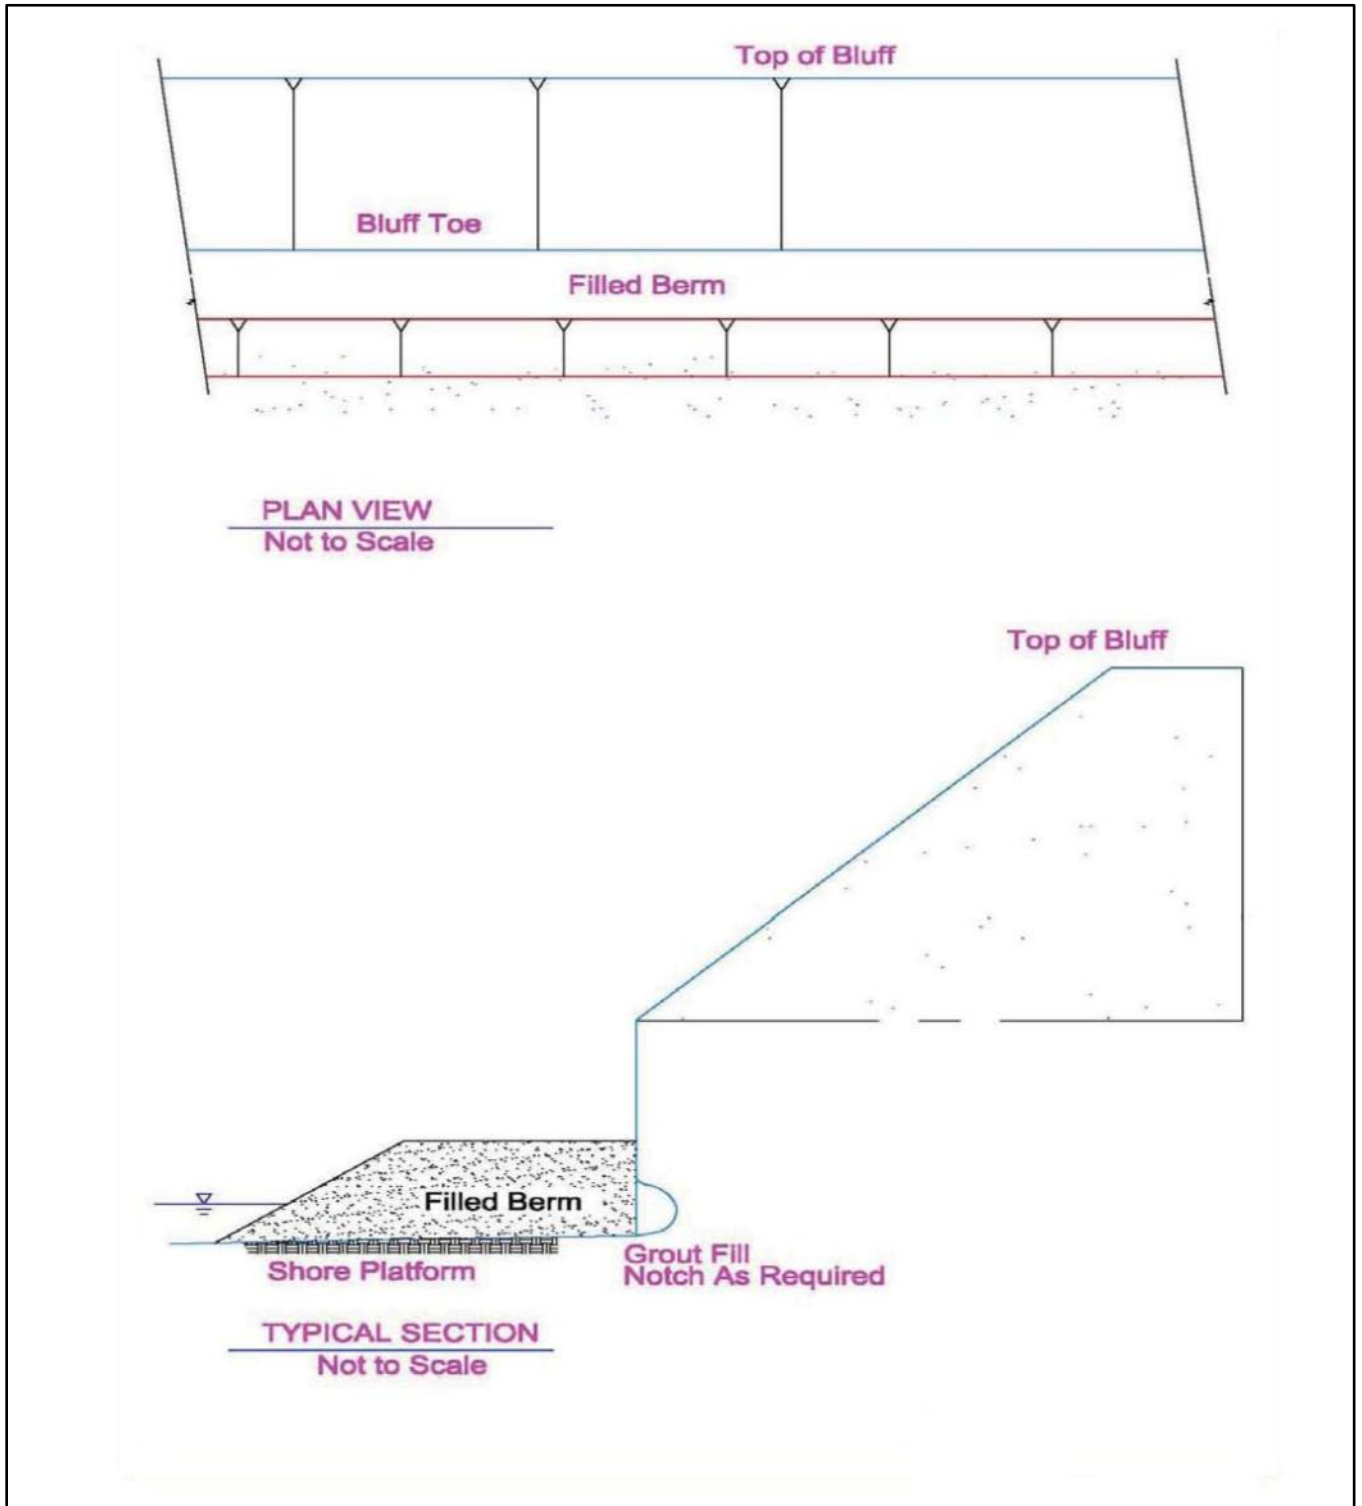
Cross Section Notch Fill (Hybrid Alternatives)
